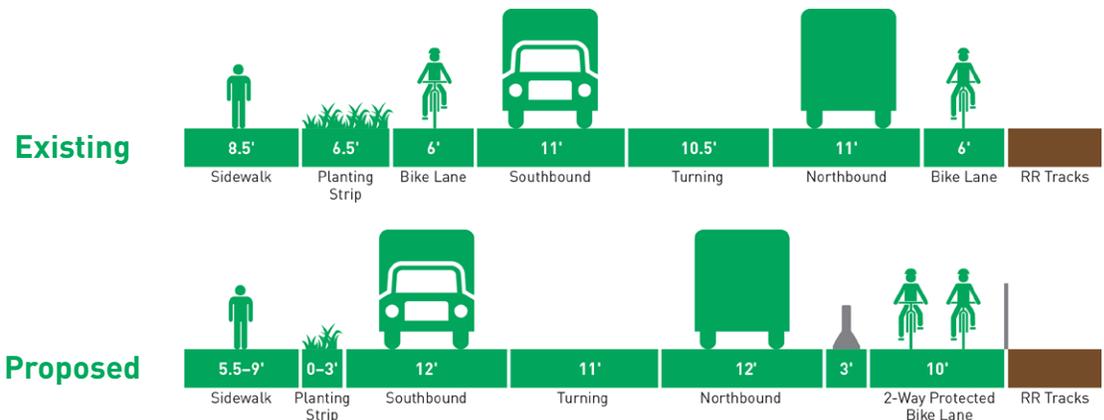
Typical Existing and Proposed Roadway Cross Sections
